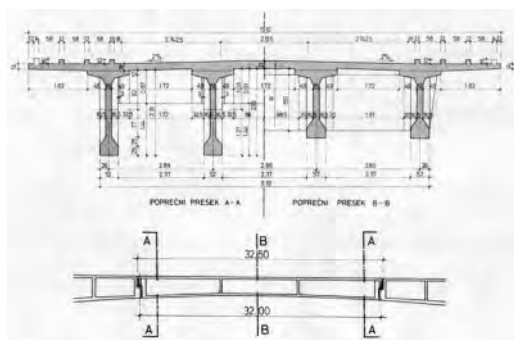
Cross and longitudinal sections of the girders. Source: Trojanović, p.134.
